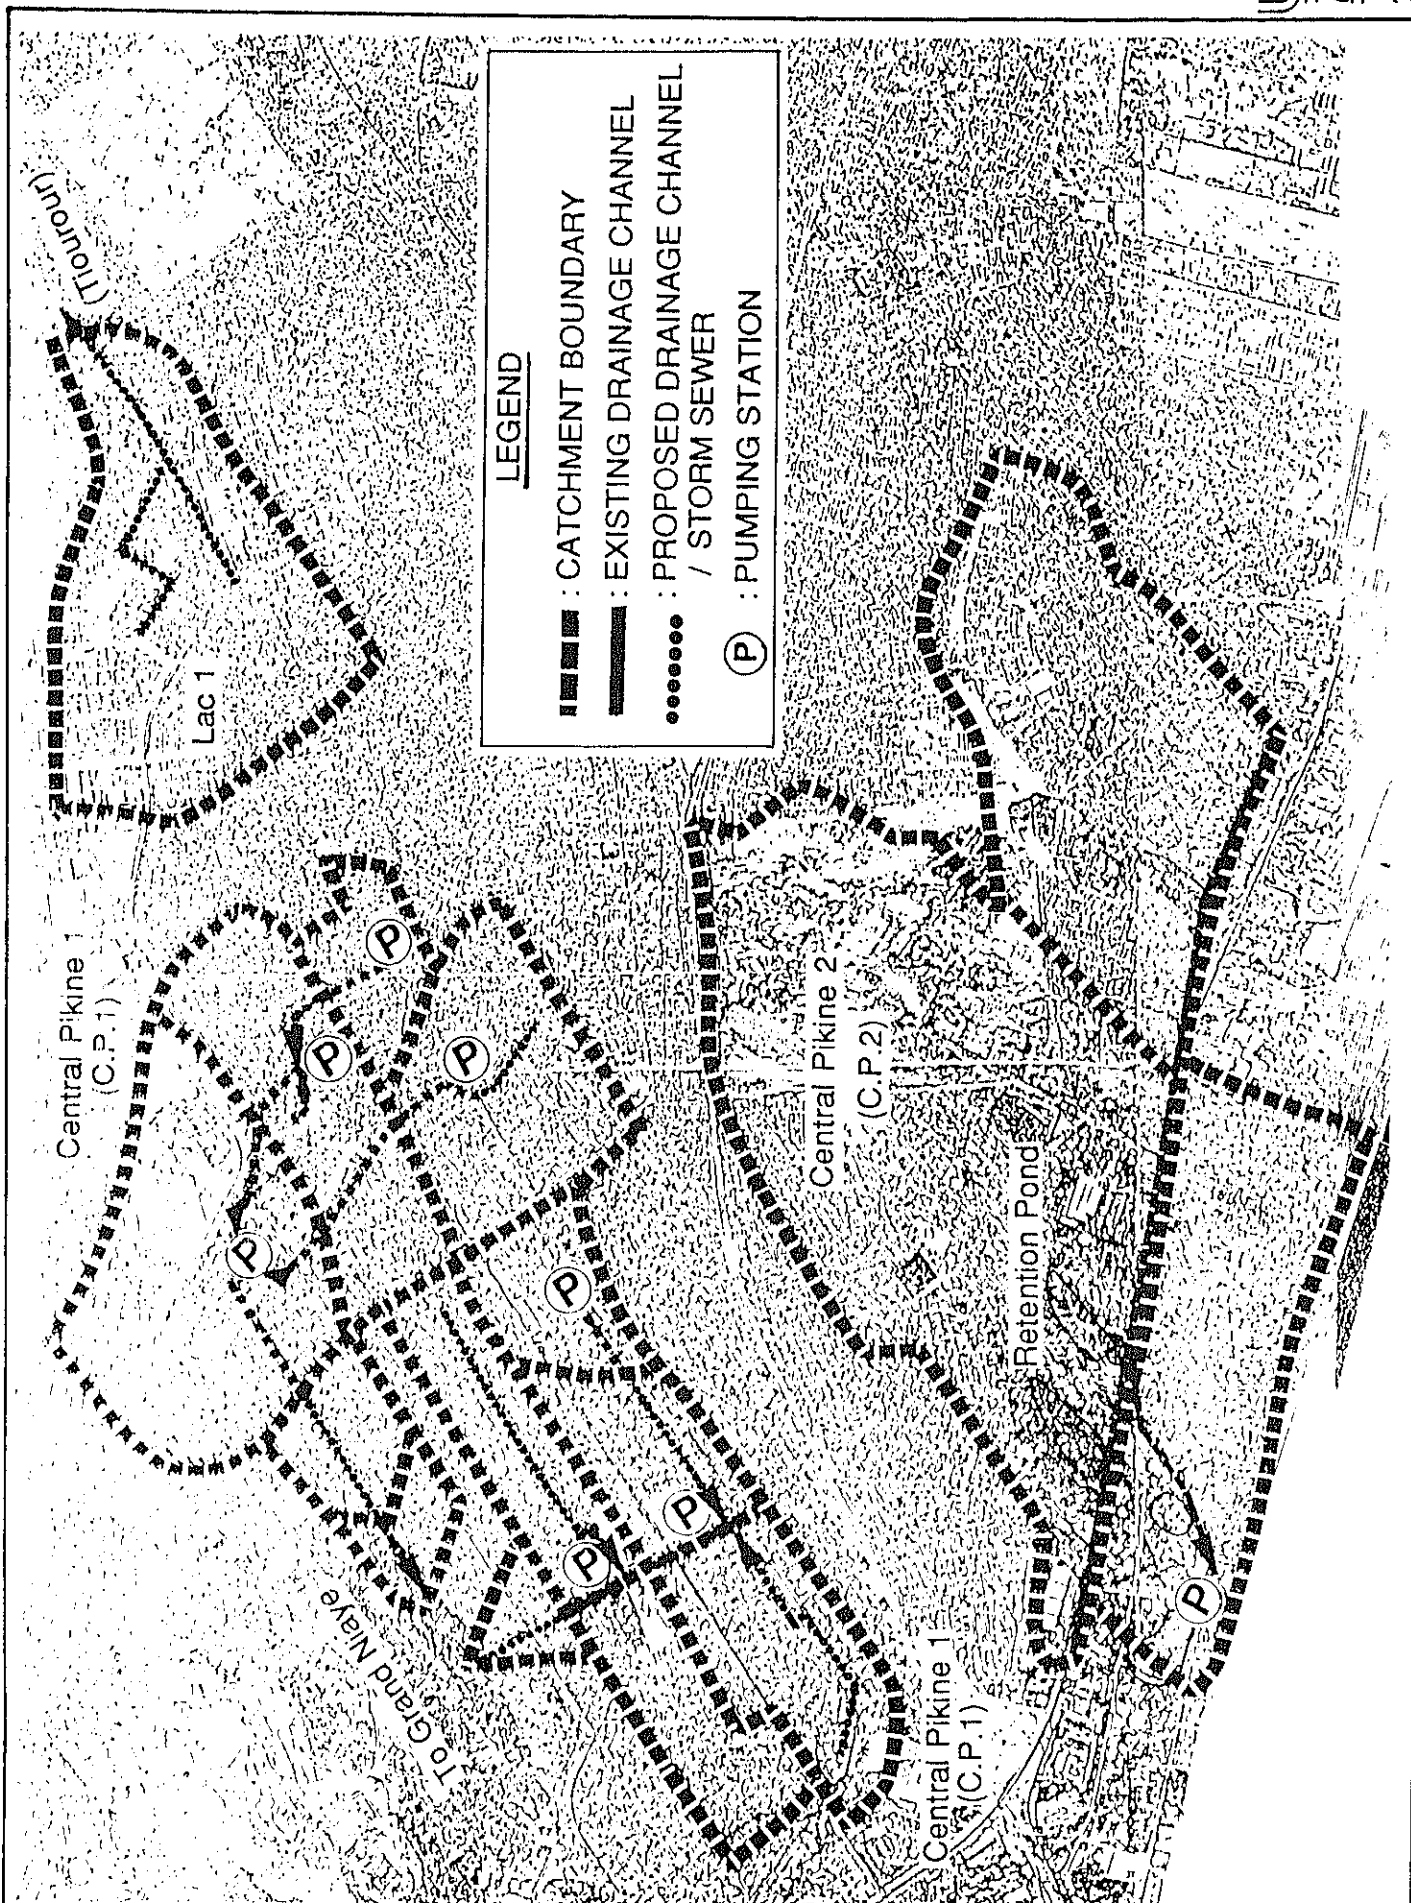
PROPOSED DRAINAGE IMPROVEMENT PLAN (PIKINE)
